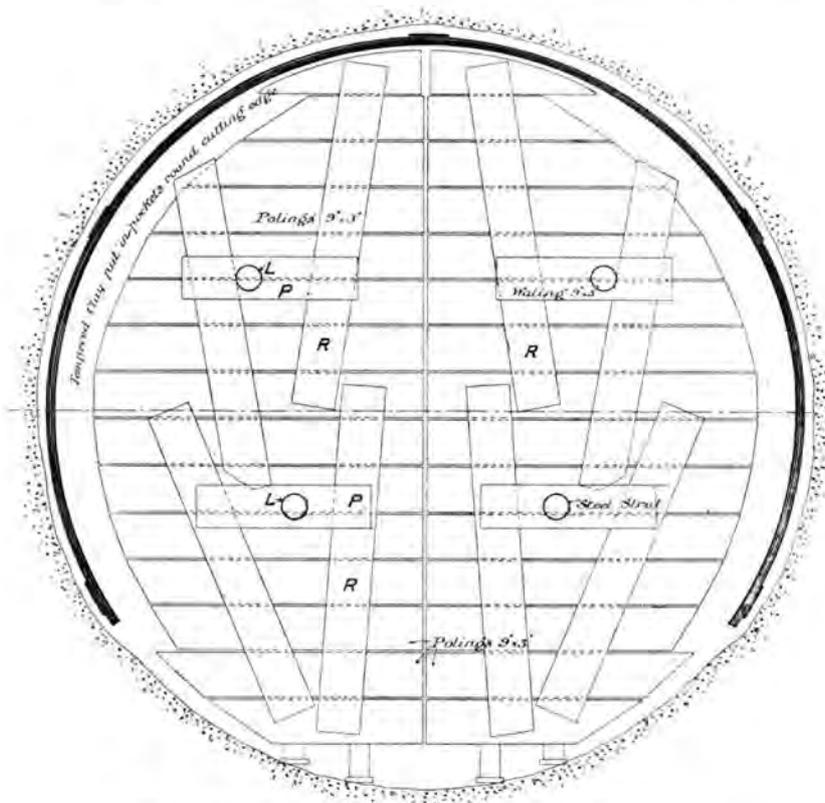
BAKER STREET AND WATERLOO RAILWAY.
